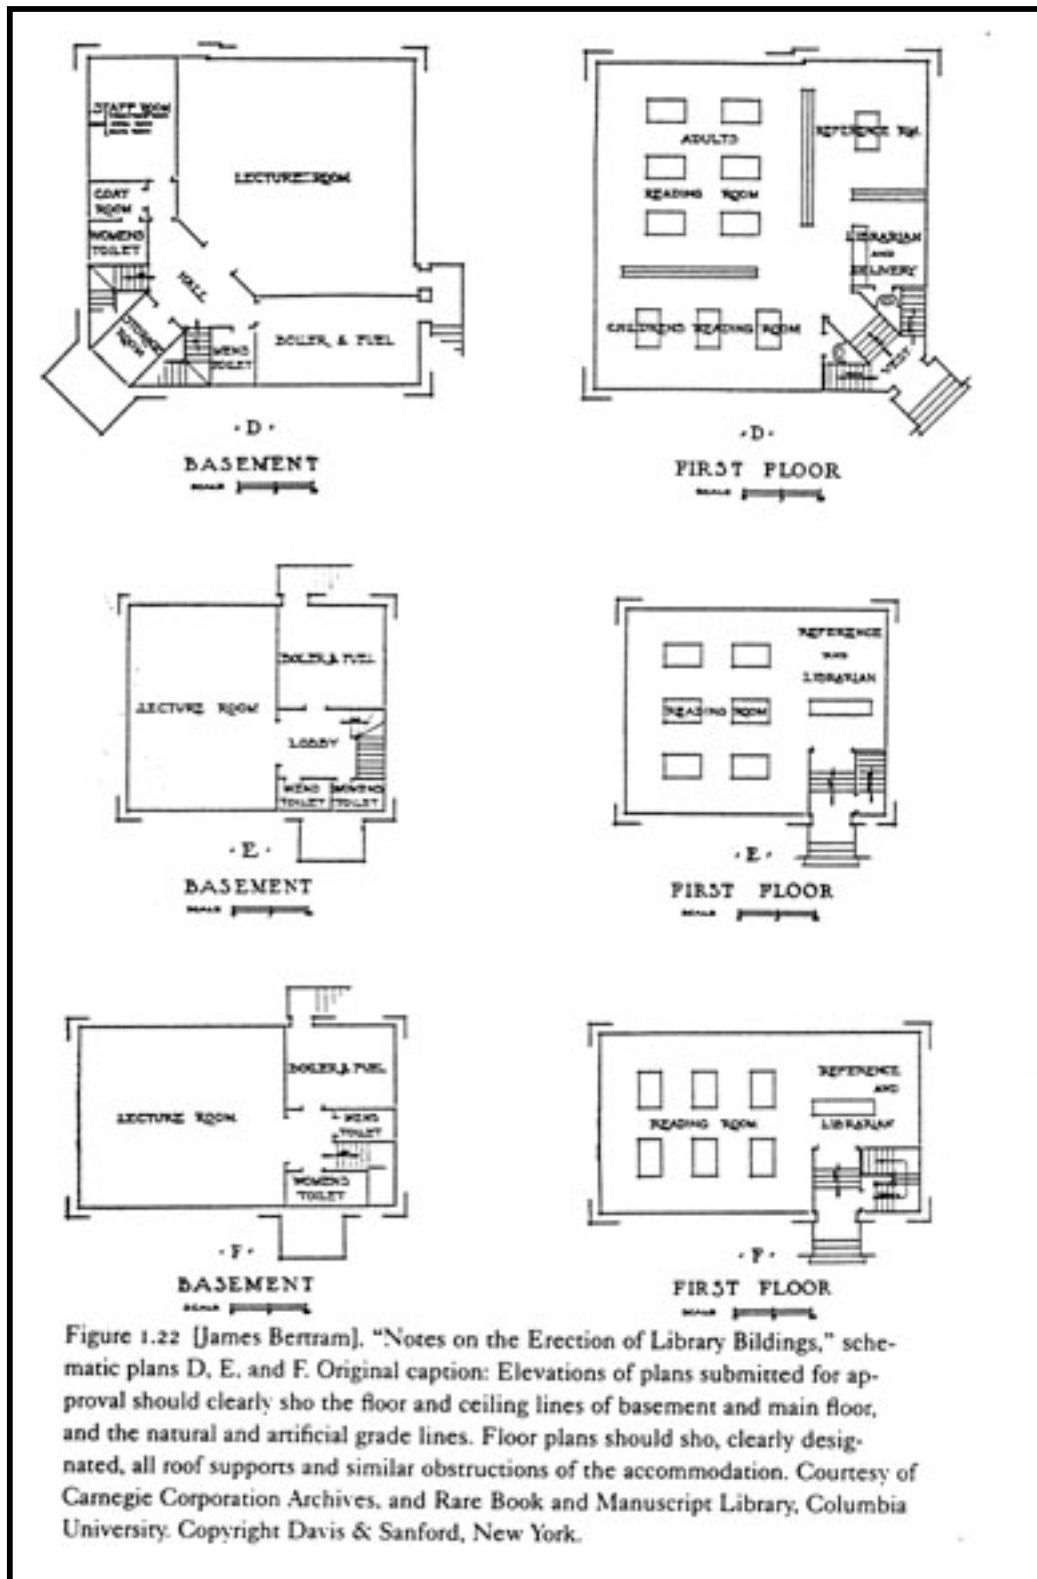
[James Bertram]. "Notes on the Erection of Library Buildings," schematic plans D, E, and F. Original caption: Elevations of plans submitted for approval should clearly show the floor and ceiling lines of basement and main floor, and the natural and artificial grade lines. Floor plans should show, clearly designated, all roof supports and similar obstructions of the accommodation. Courtesy of Carnegie Corporation Archives, and Rare Book and Manuscript Library, Columbia University. Copyright Davis & Sanford, New York.
